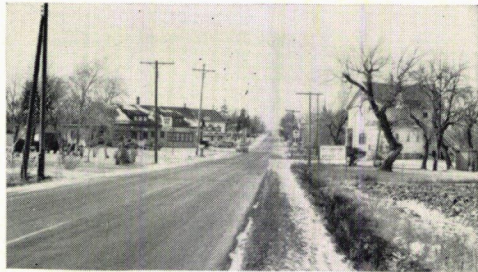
Location 6(a): Looking north on Old US 41 at Fussville about 2 1/2 miles southeast of Menomonee Falls.
